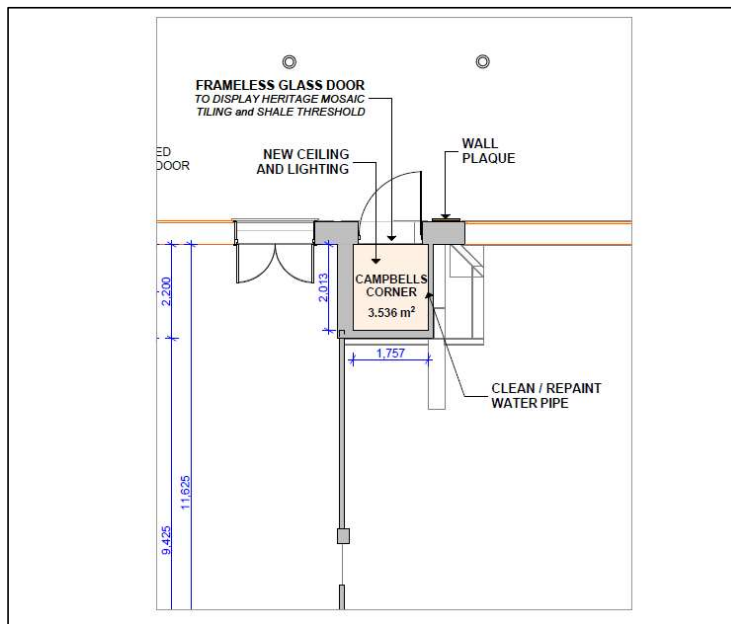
Proposed Floor Layout – Proposed Heritage Tile Display (Source: A&H Eco Group)
